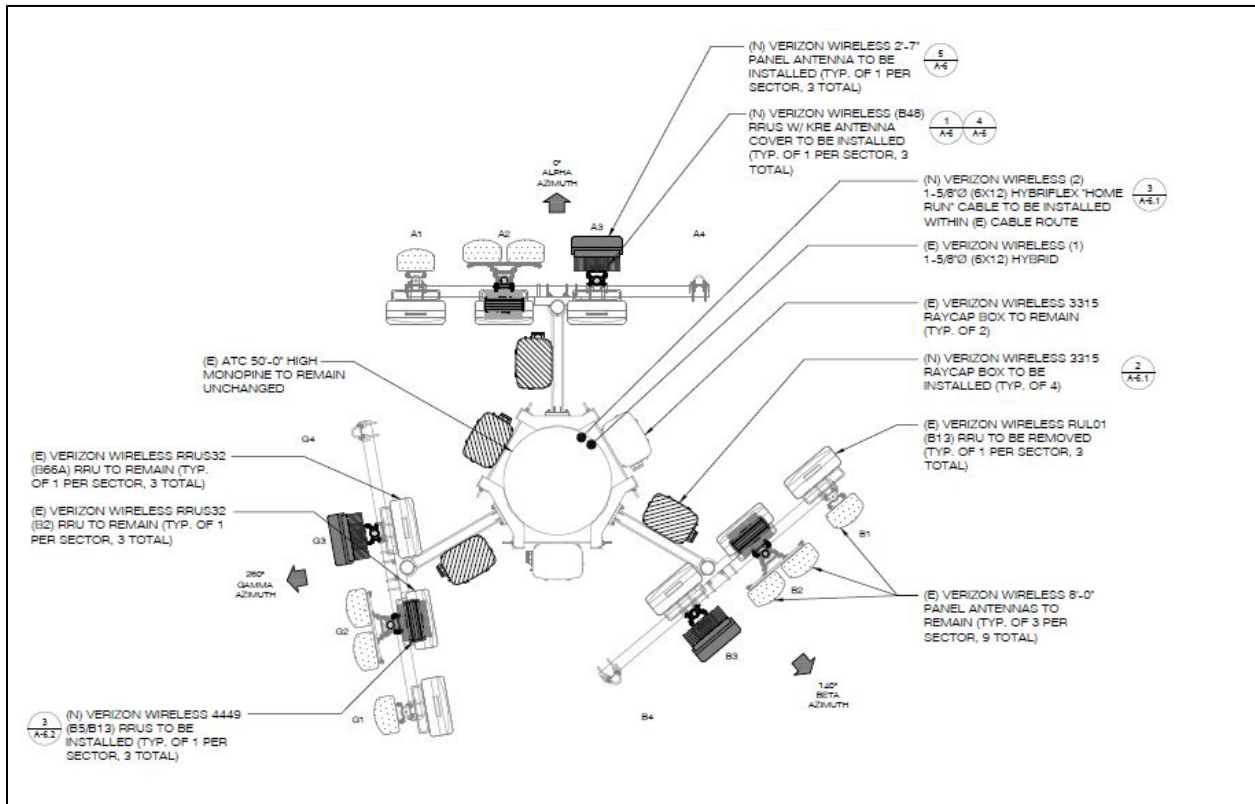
Proposed antenna layout plan on the monopole (Source: Plans, page A-3).
